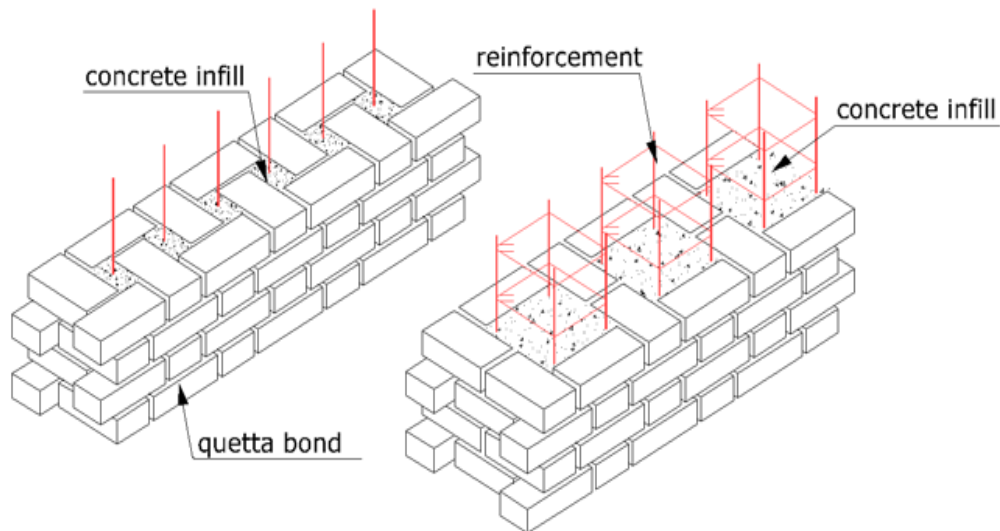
Reinforced Masonry Walls (Quetta Bond)
